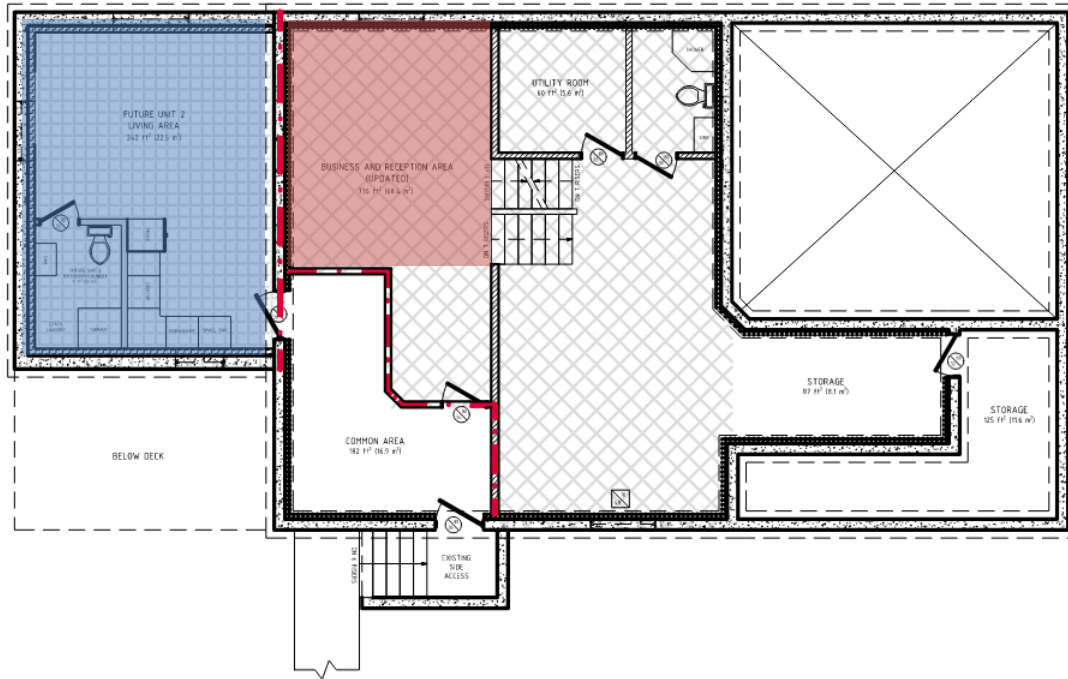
The basement floor plan where the home occupation is and the ADU will be proposed
